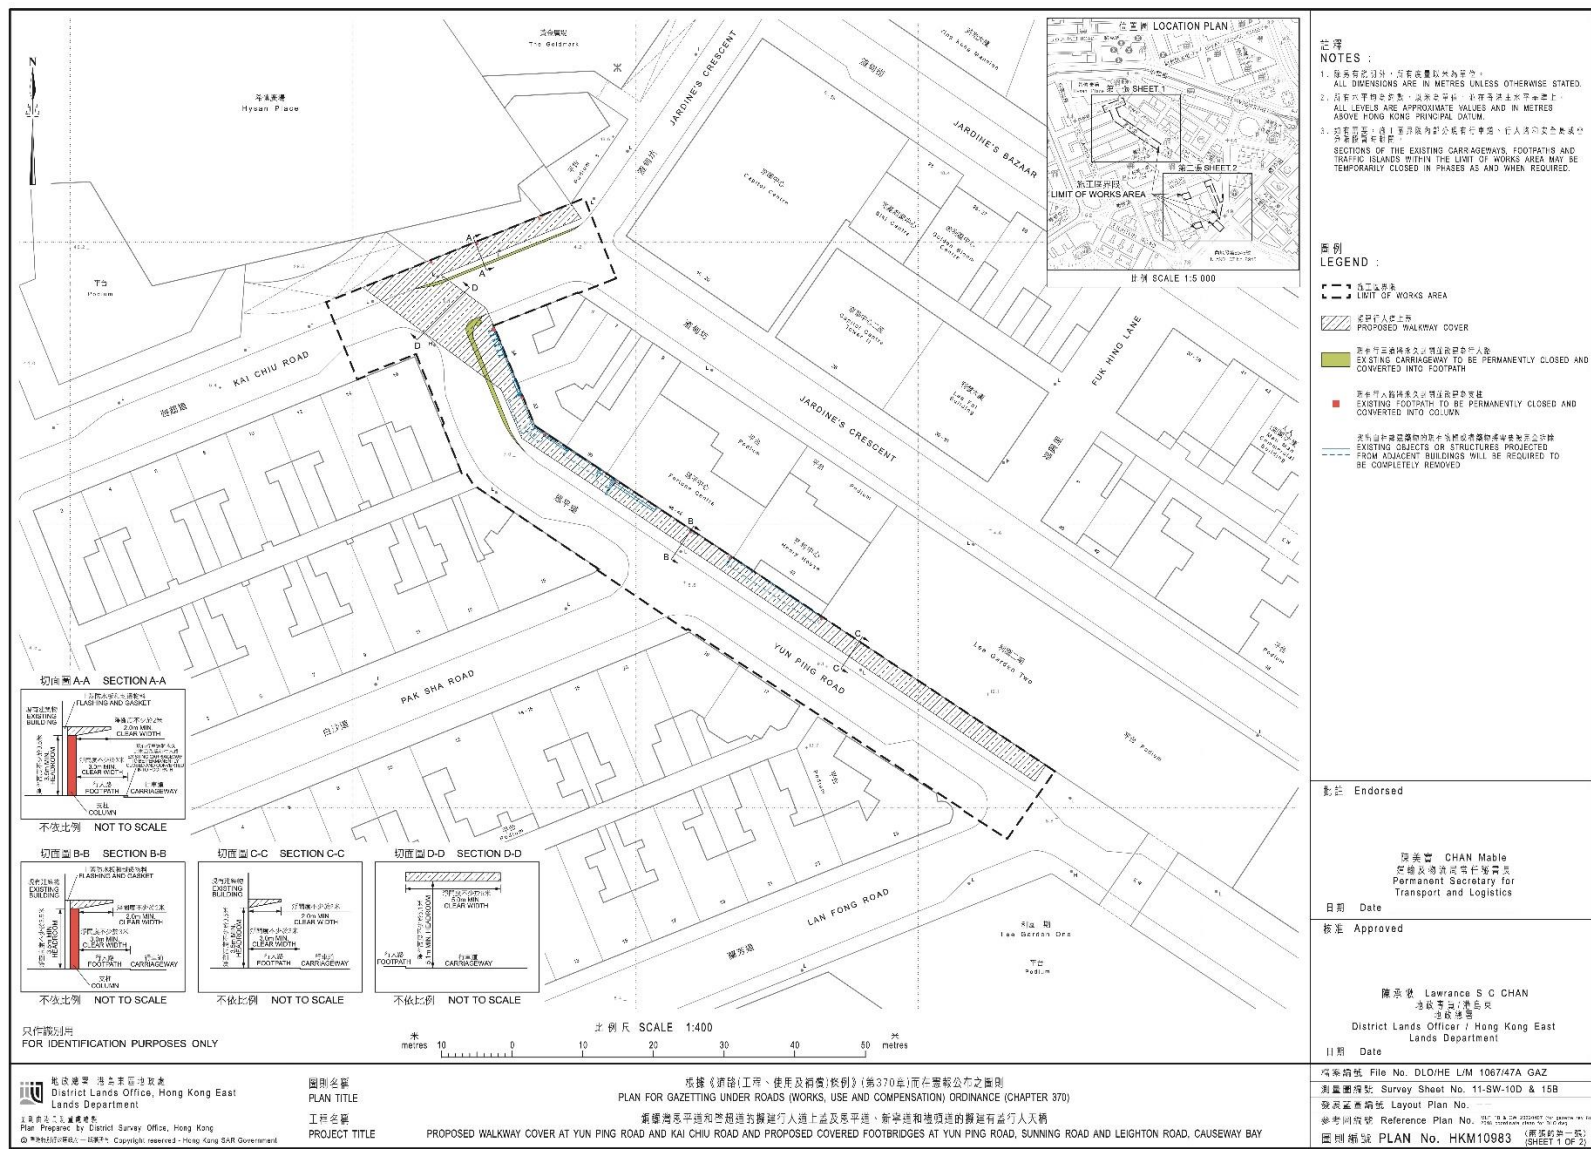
Plan showing the location of the covered walkway at Yun Ping Road and Kai Chiu Road, Causeway Bay
